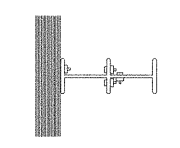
DETAIL OF A SINGLE WHITE OR SINGLE YELLOW DELINEATOR
